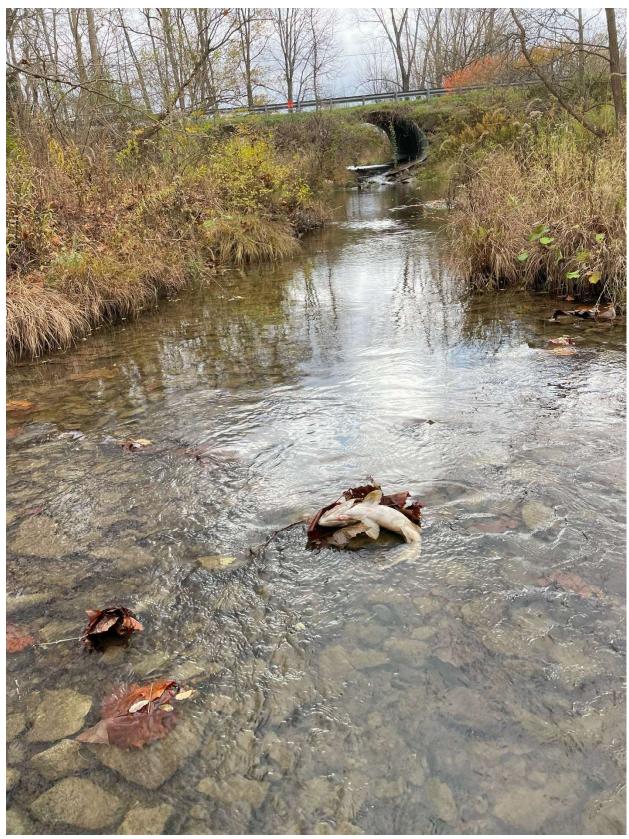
Curry Road east culvert looking south. Dead trout in the stream in the foreground.
